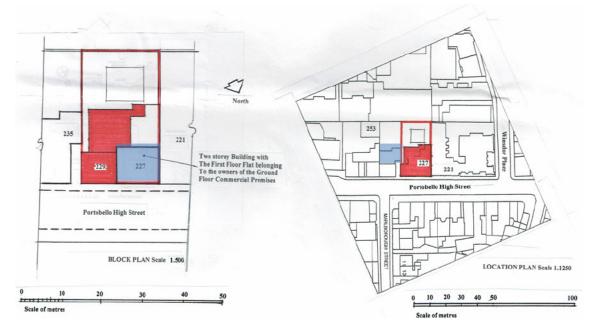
Site location. The proposed site is highlighted in red. The nearest noise sensitive receptors are highlighted in blue
